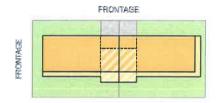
Dwelling Typologies – Strata Lots
